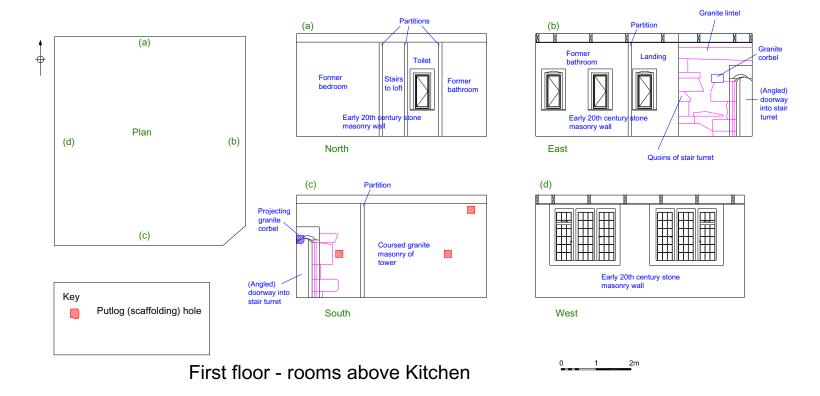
Annotated elevations of the tower interior: rooms above Kitchen
